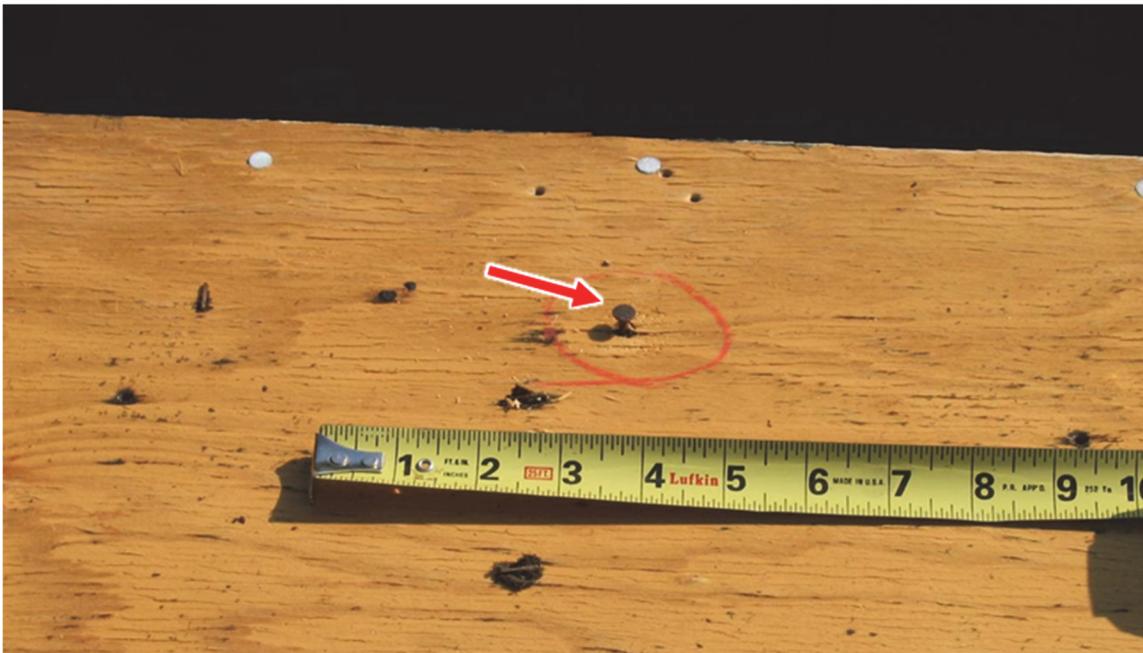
Nail withdrawal from plywood roof sheathing due to long-term moisture cycling (photo credit: Exponent).
